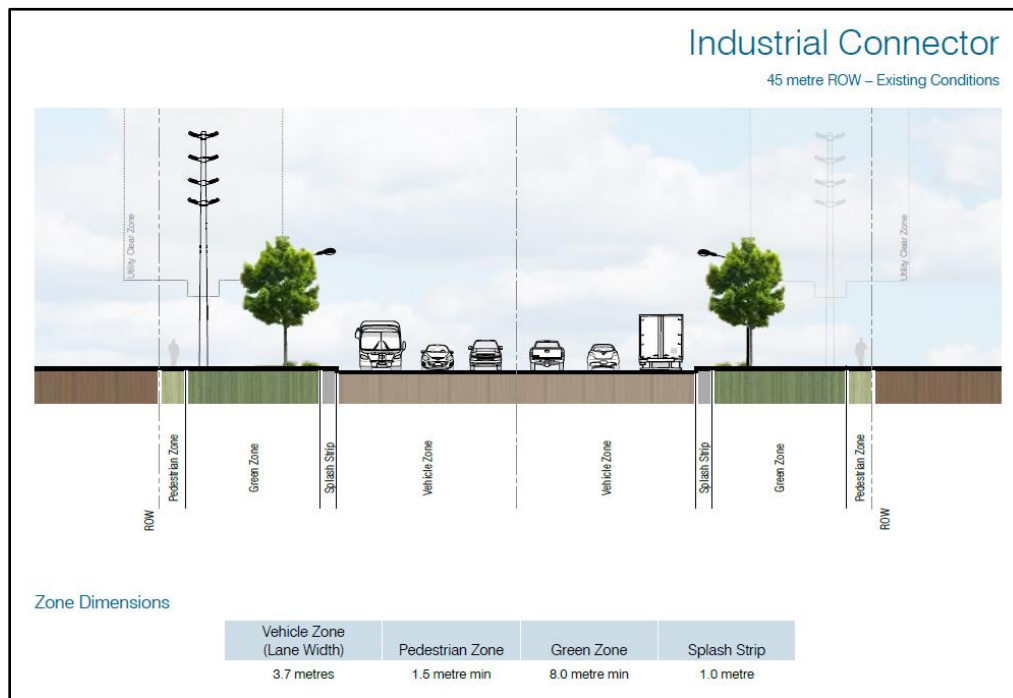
Illustrative Roadway Cross Section for Industrial Connector
